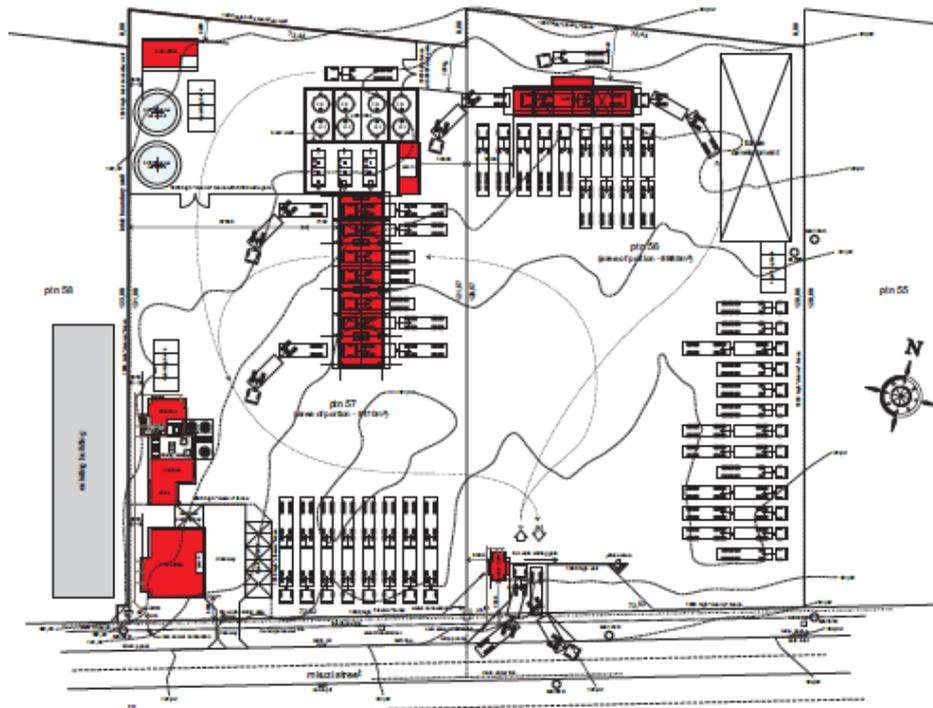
Preferred site layout plan for the proposed truck stop and associated infrastructure on Erf 56 ad 57 in Mossdustria.
